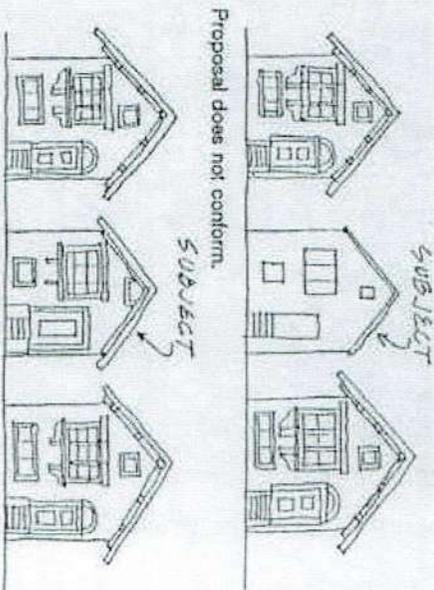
The use of door and window trim, window sill detailing, detail of the door, and detailing of the entry stairs establishes an architectural detail context.
